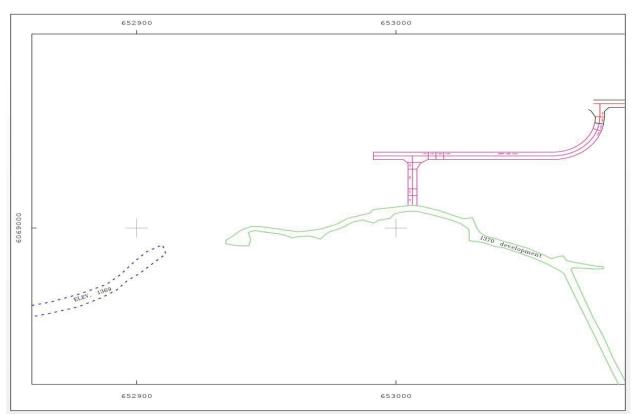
1370 Stope Access Plan, 1370 Level Stopes
